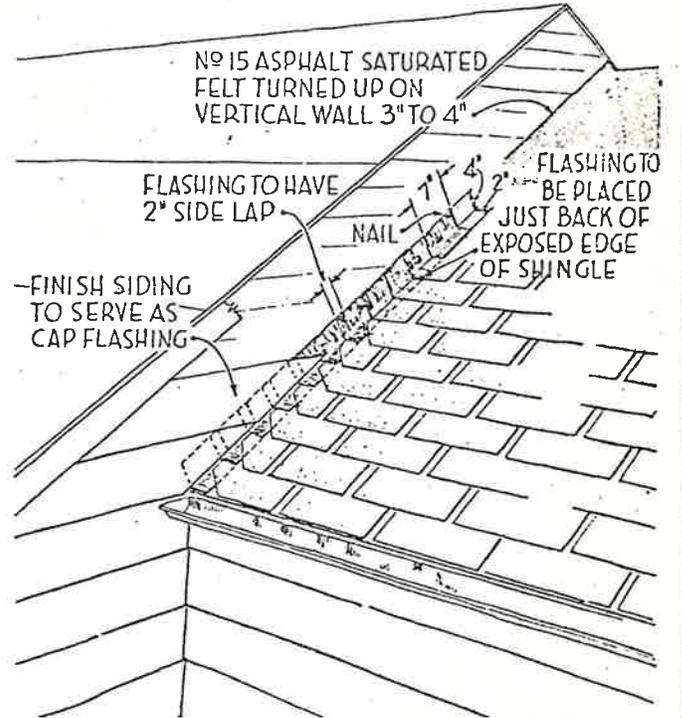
Use of metal flashing shingles to protect joint between sloping roof and vertical wall.
